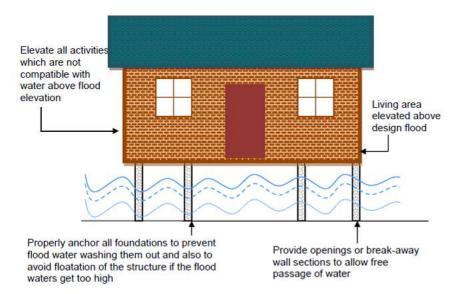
Substantial buildings to be set back from Hazard zones ad lifted so storm waters flow under
